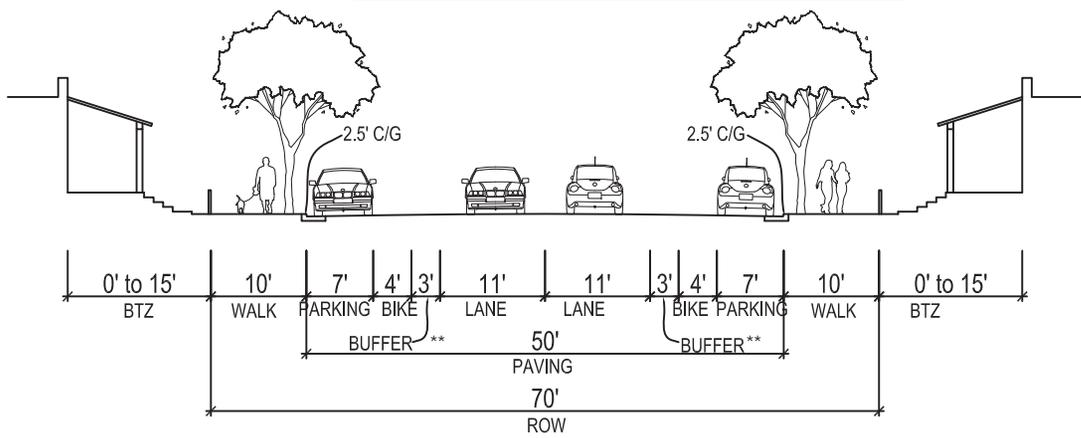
Street Type 10.2: Park Edge Double-Loaded
